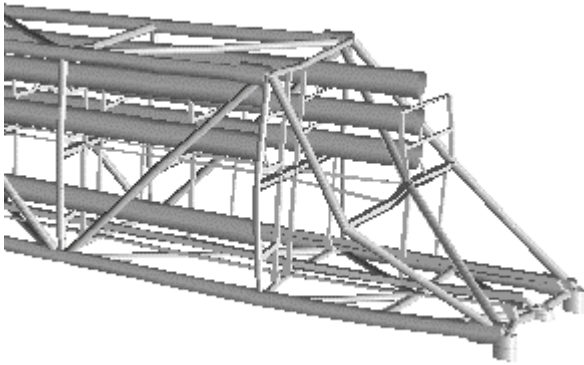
Collapse mode due to fire and with 5% overload. First modification.
